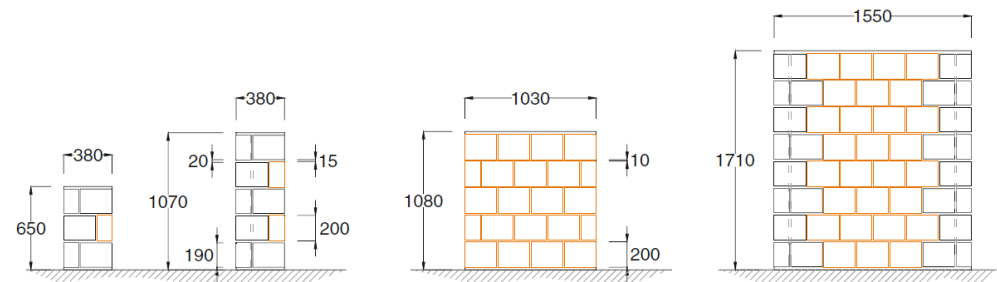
Specimens for compression tests: confining columns (left); plain masonry (center); complete reinforced masonry system (right)
